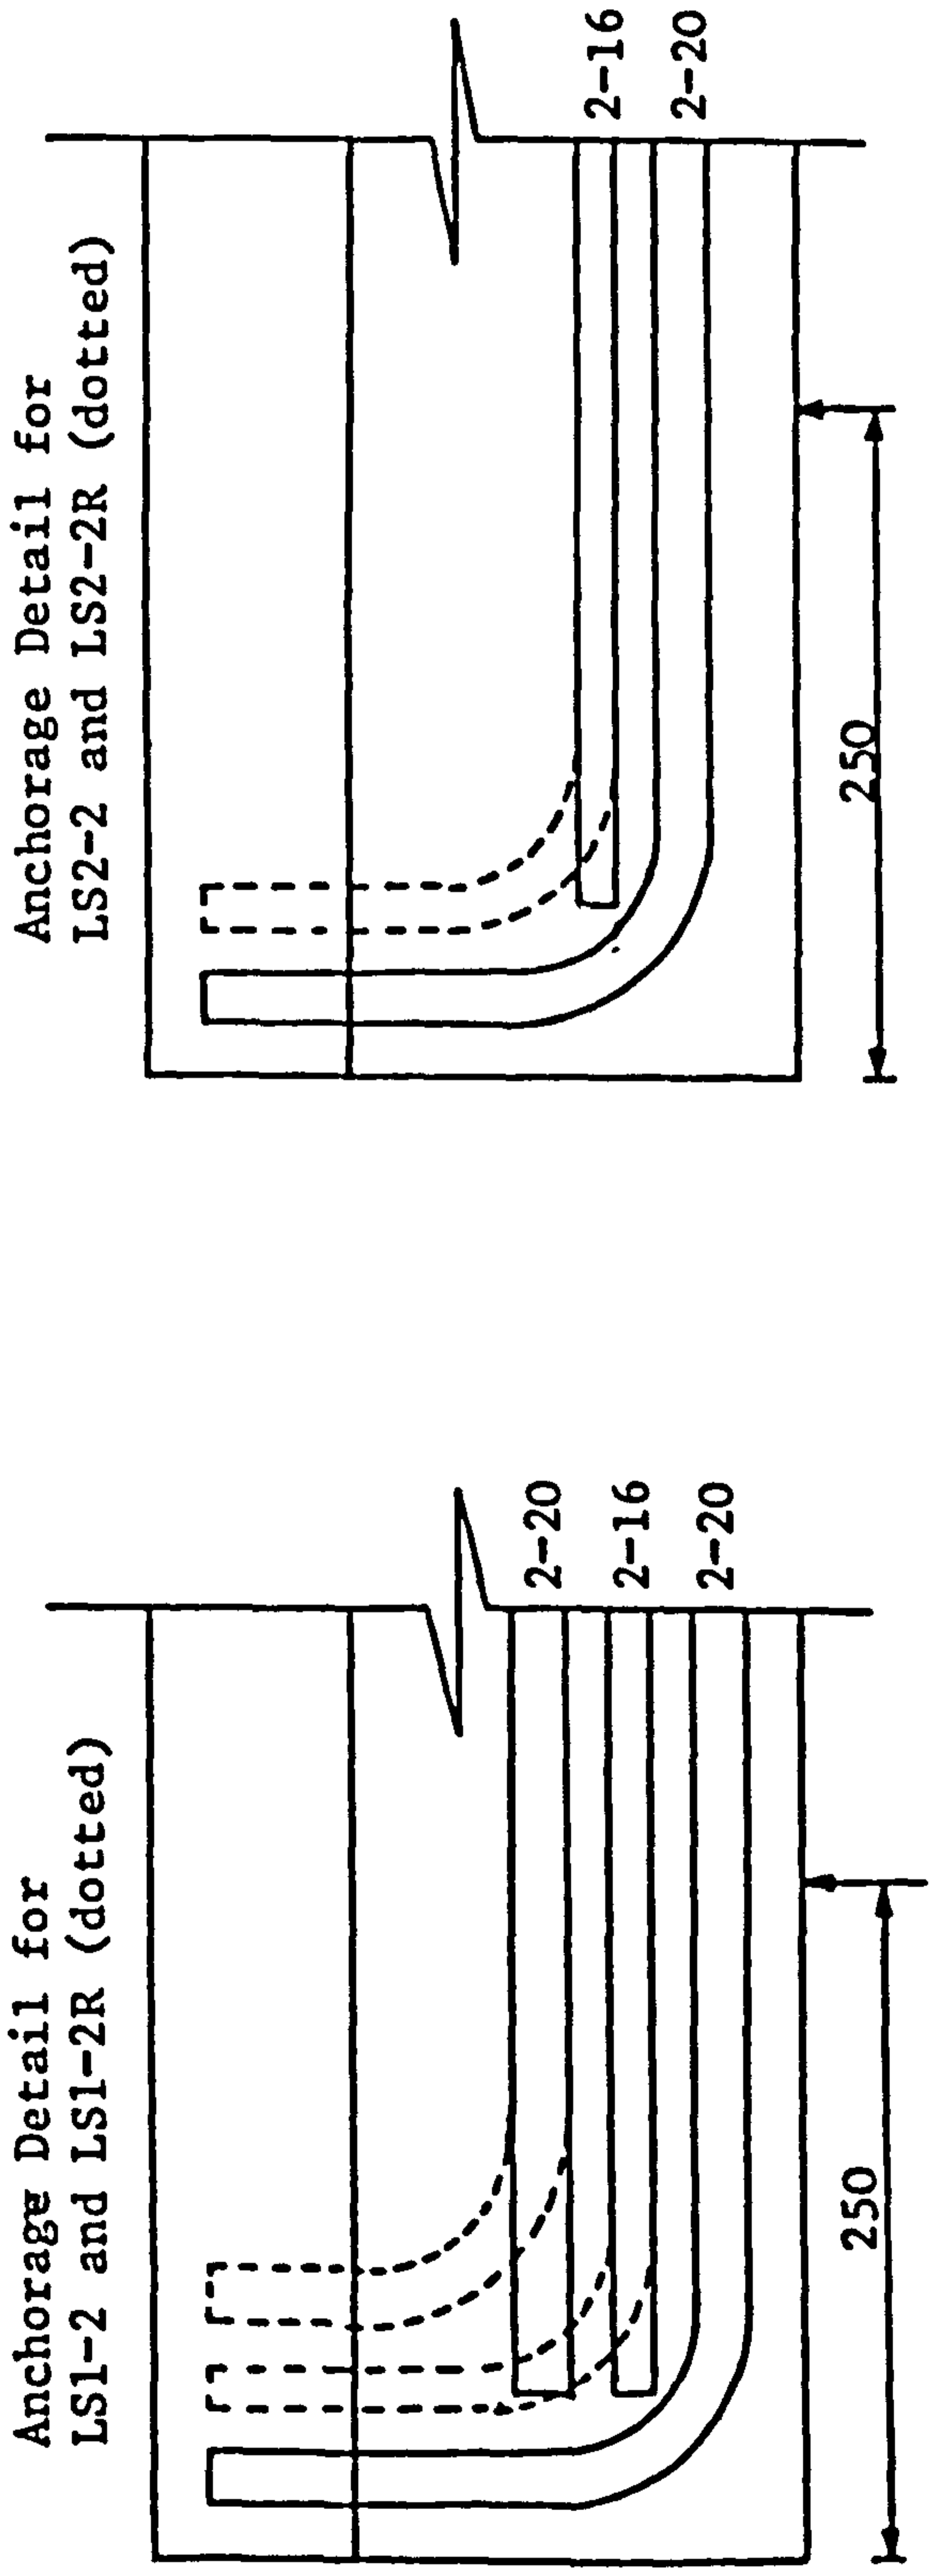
GENERAL REINFORCEMENT DETAILS FOR SHEAR SPECIMENS
